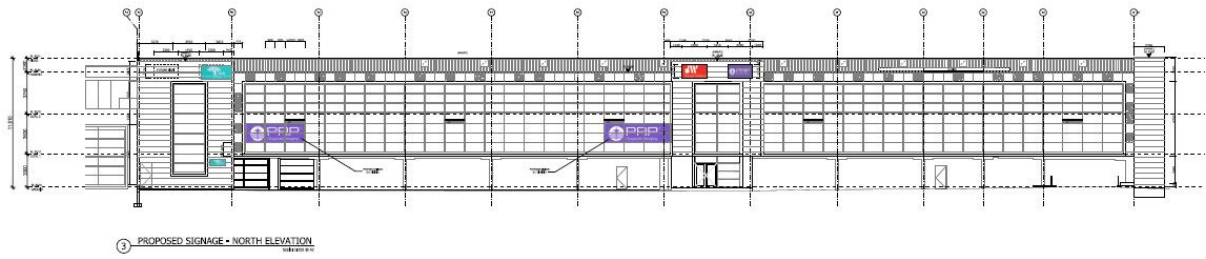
North Elevation Drawing showing All Existing and Proposed Signs when completed.
